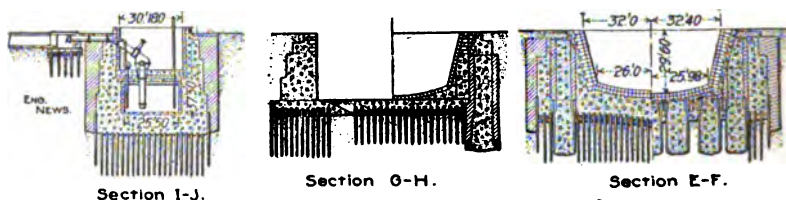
KOBE DRY DOCK CROSS-SECTIONS.
